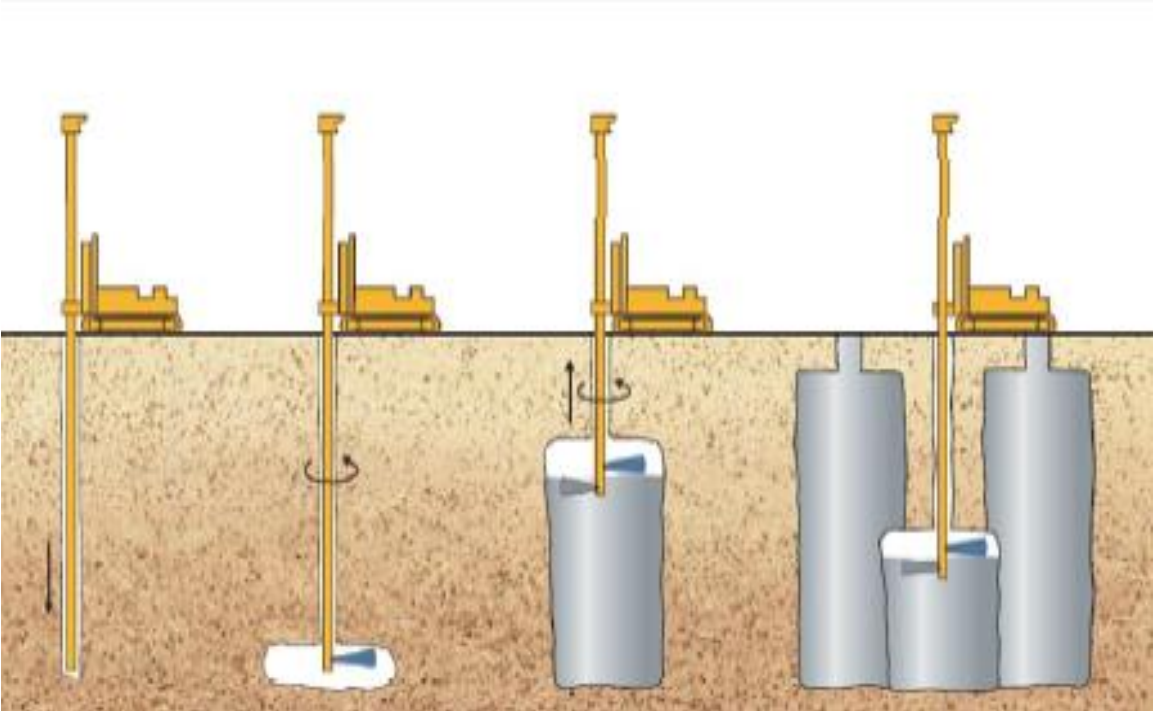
Show MSM applied over cemented columns to strengthen the base layer below a road embankment. Illustration from (Covicorp, 2020).
